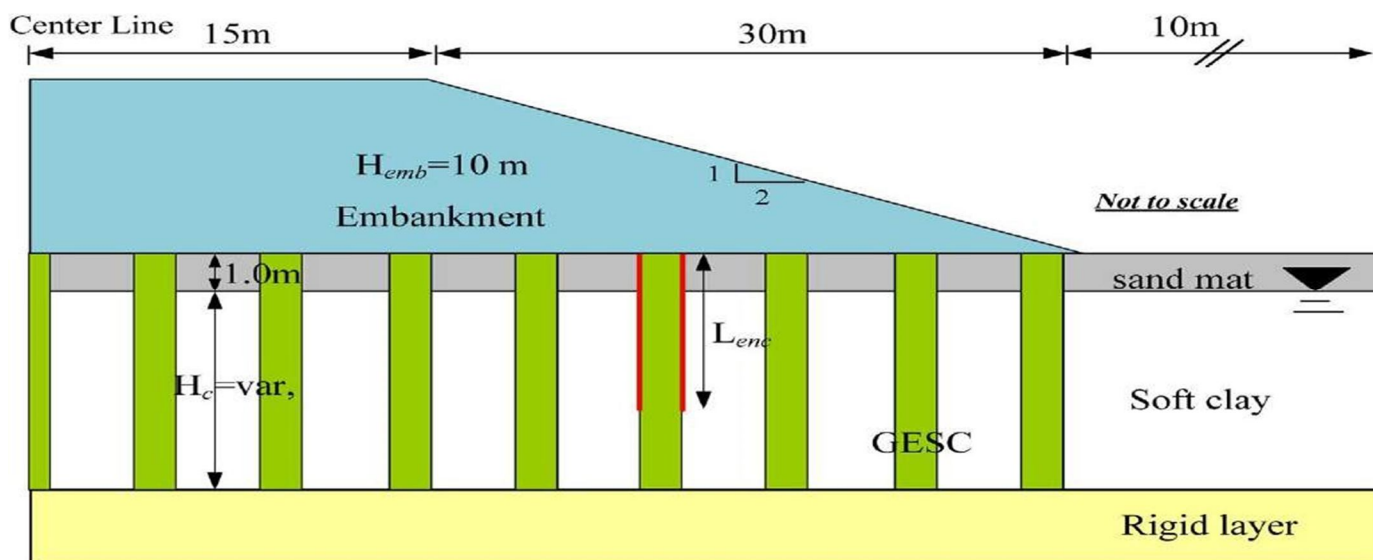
The cross section of geosynthetic-encased stone column reinforced ground [31]
